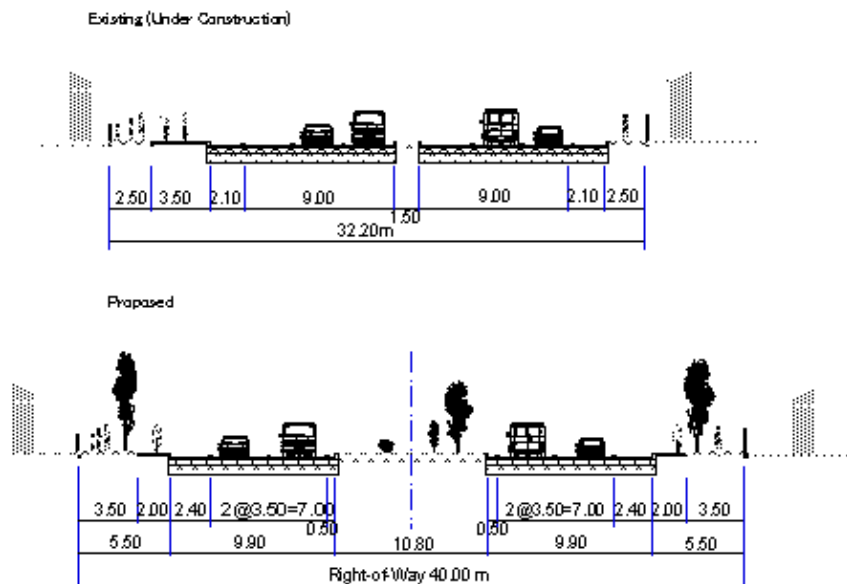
Proposed Cross Section for Avenida Mario Covas
